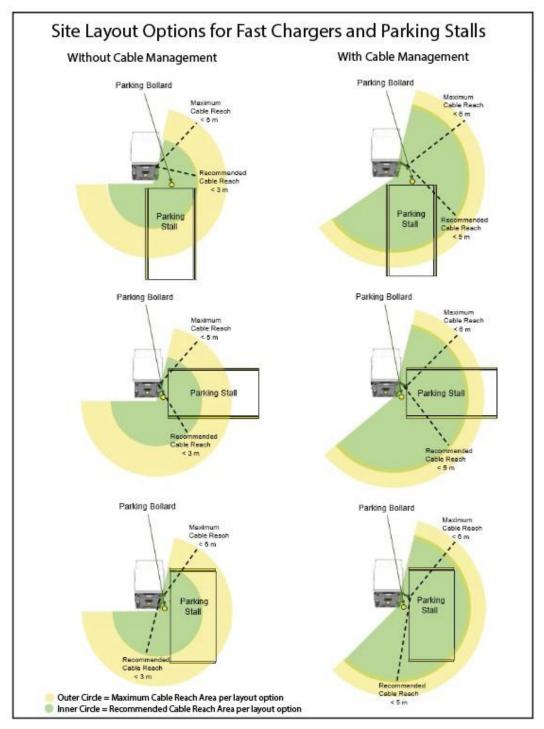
Layout options for Fast Charger's Parking Stalls showing Cable Reach areas
